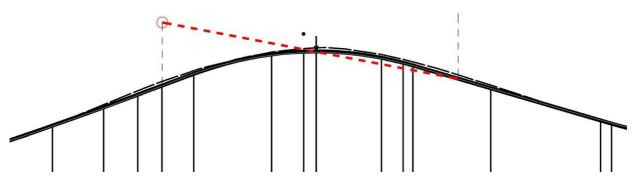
Sight distance requirements will not be met on the crest of the proposed access road
